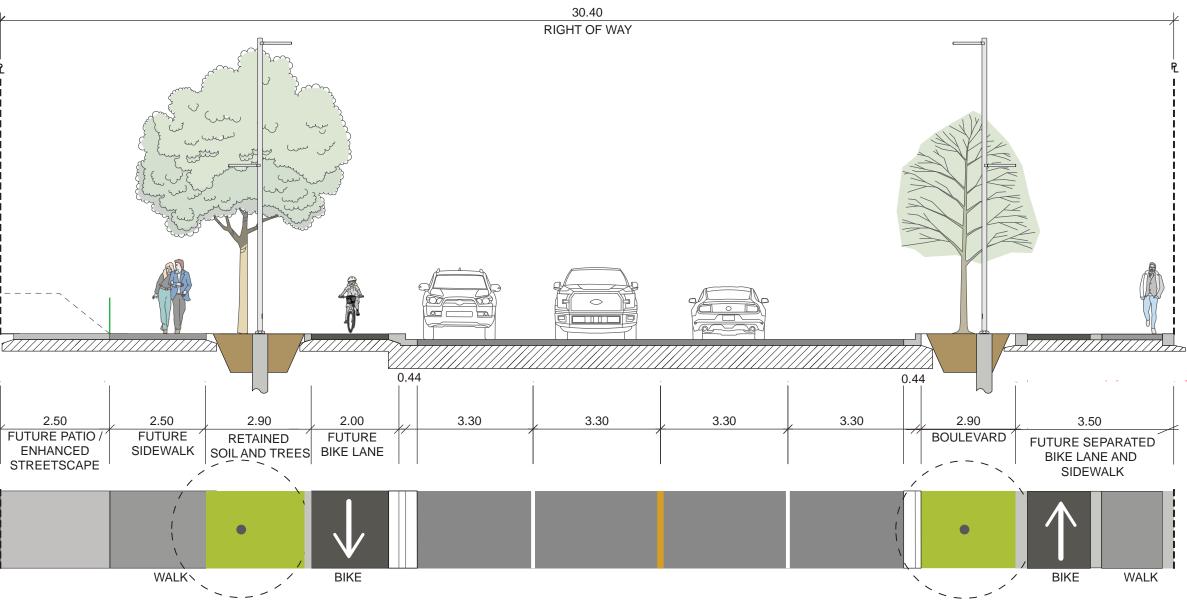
ZONE 2 ULTIMATE SECTION
